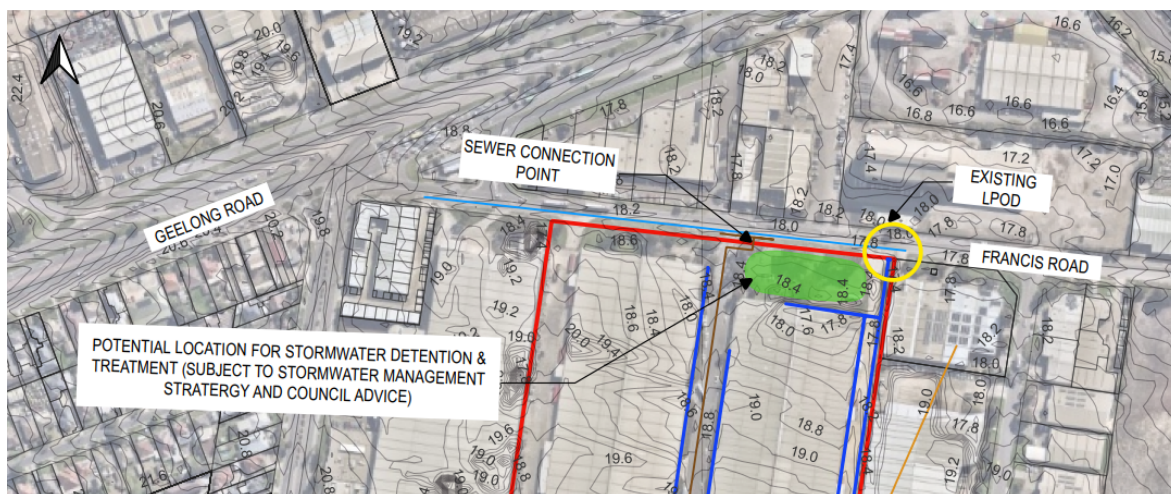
Stormwater existing LPOD for existing site (source:DPM Preliminary Drainage Assessment Plan)
